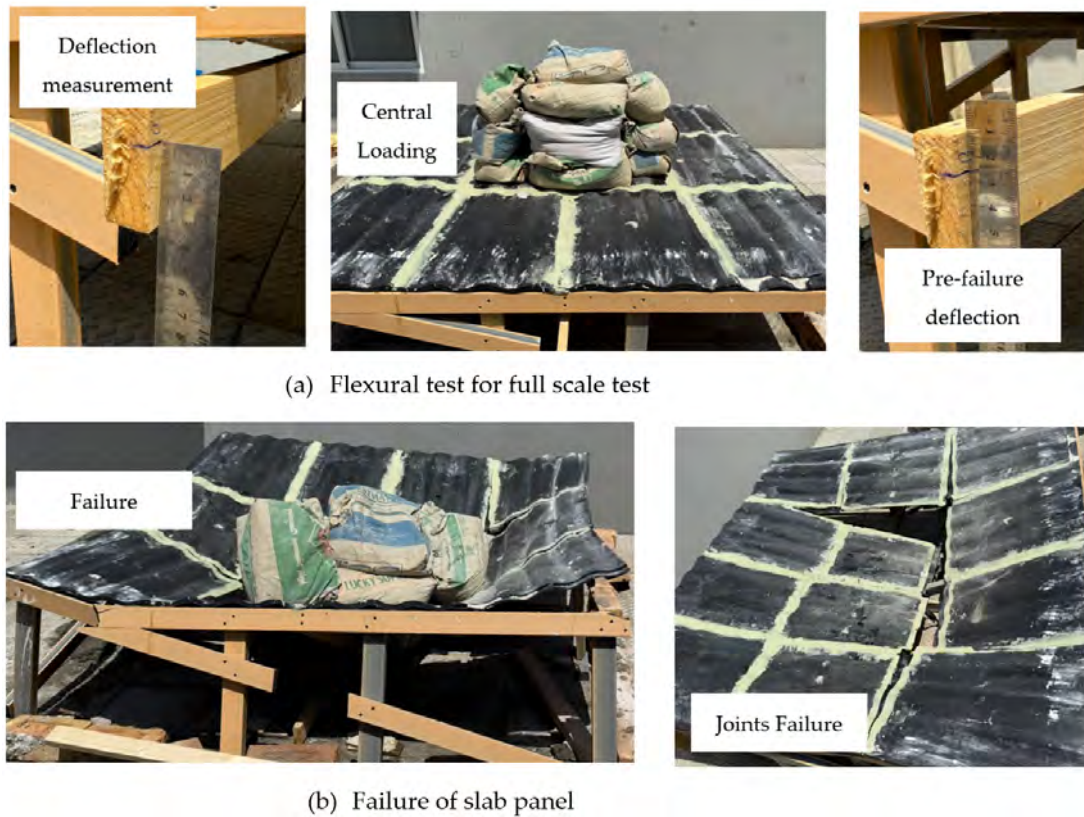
Testing of recycled plastic prototype slabs. (a) Test setup and (b) failure of prototype slab.
